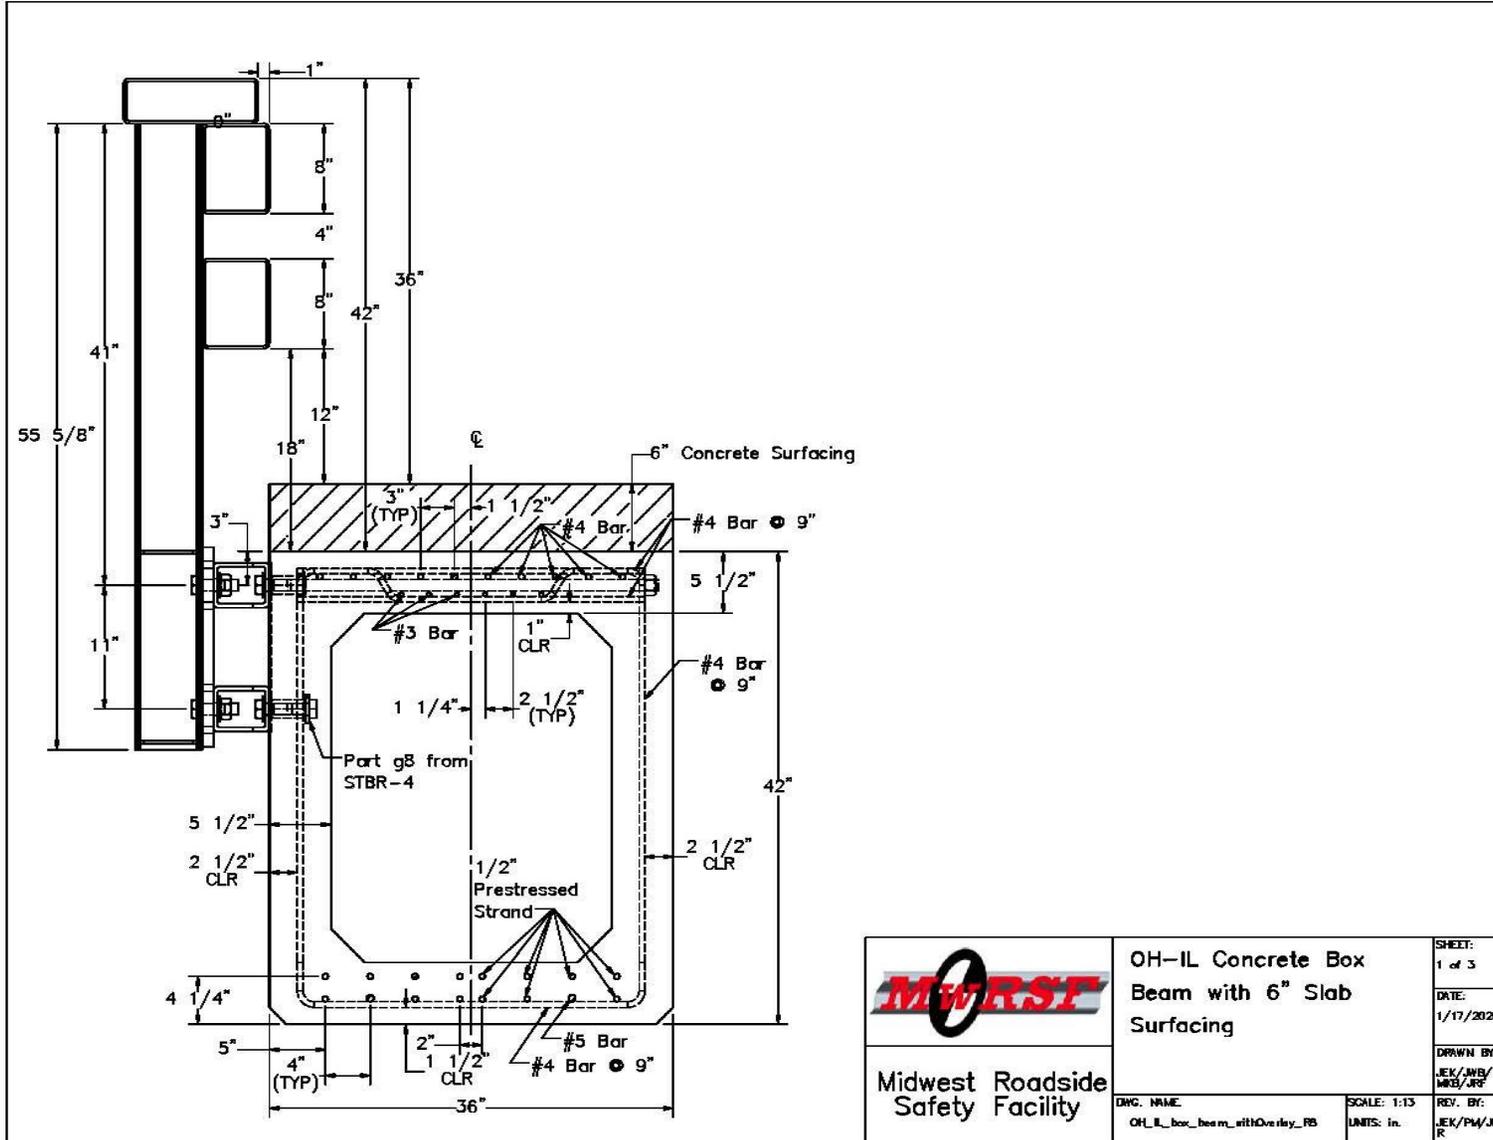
Typical 42-in. (1067-mm) Deep Concrete Box-Beam Girder Configuration with Concrete Wearing Surface
